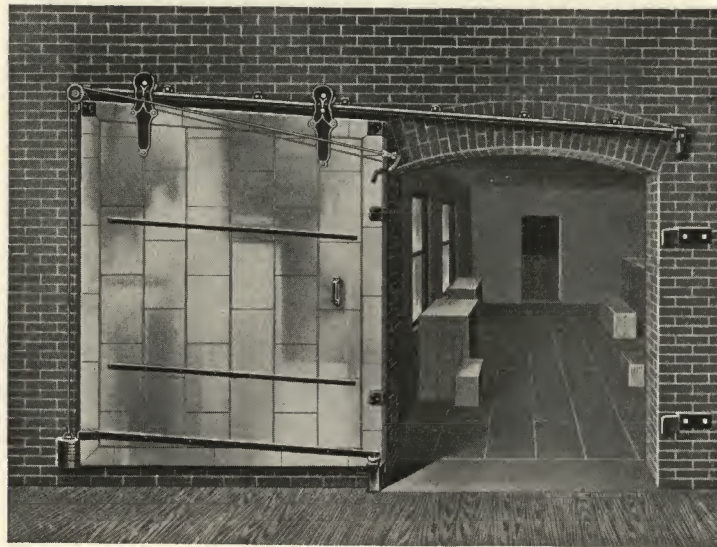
No. 646 Fire Door Fixtures Applied to a Left Hand Tin Clad Fire Door.
